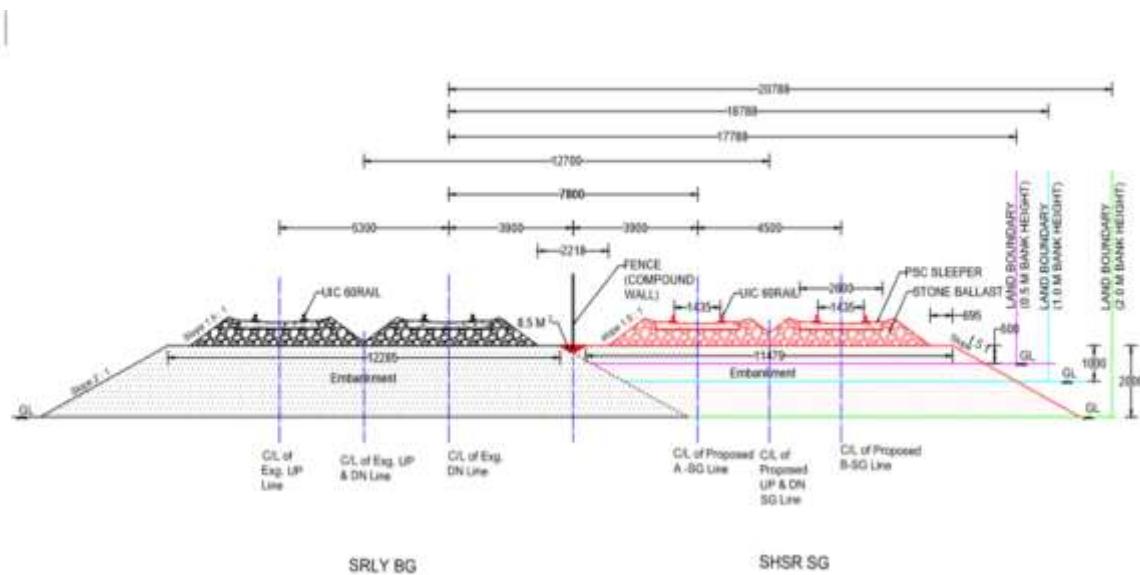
Typical CS showing SilverLine tracks parallel to existing railway tracks
